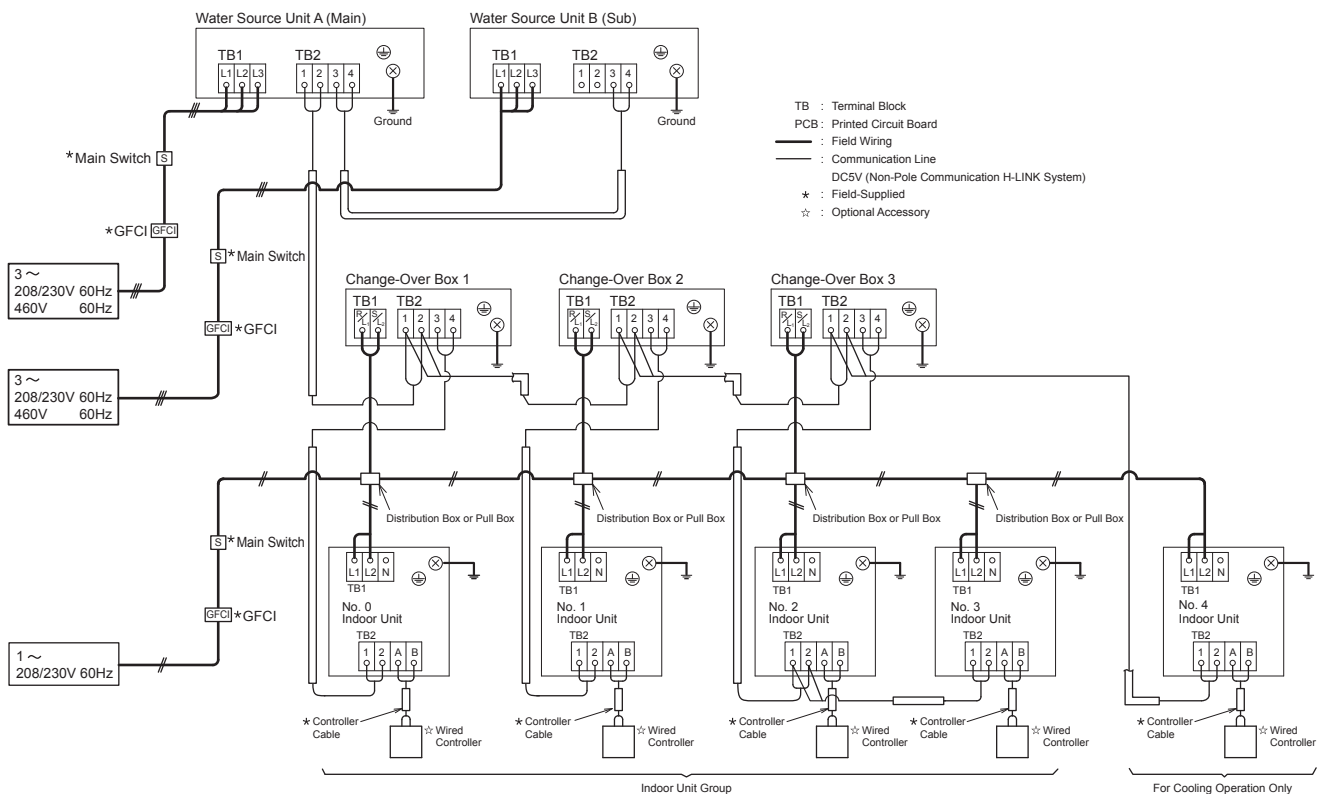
Layout for Electrical Wiring Connection (Heat Recovery System)
